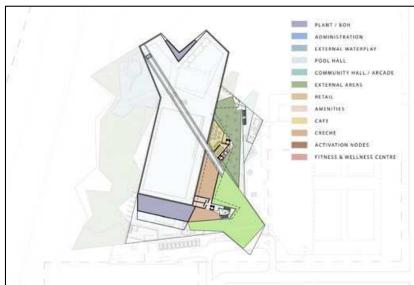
Woodward Place (Whitlam Leisure Centre) Second Floor Plan
